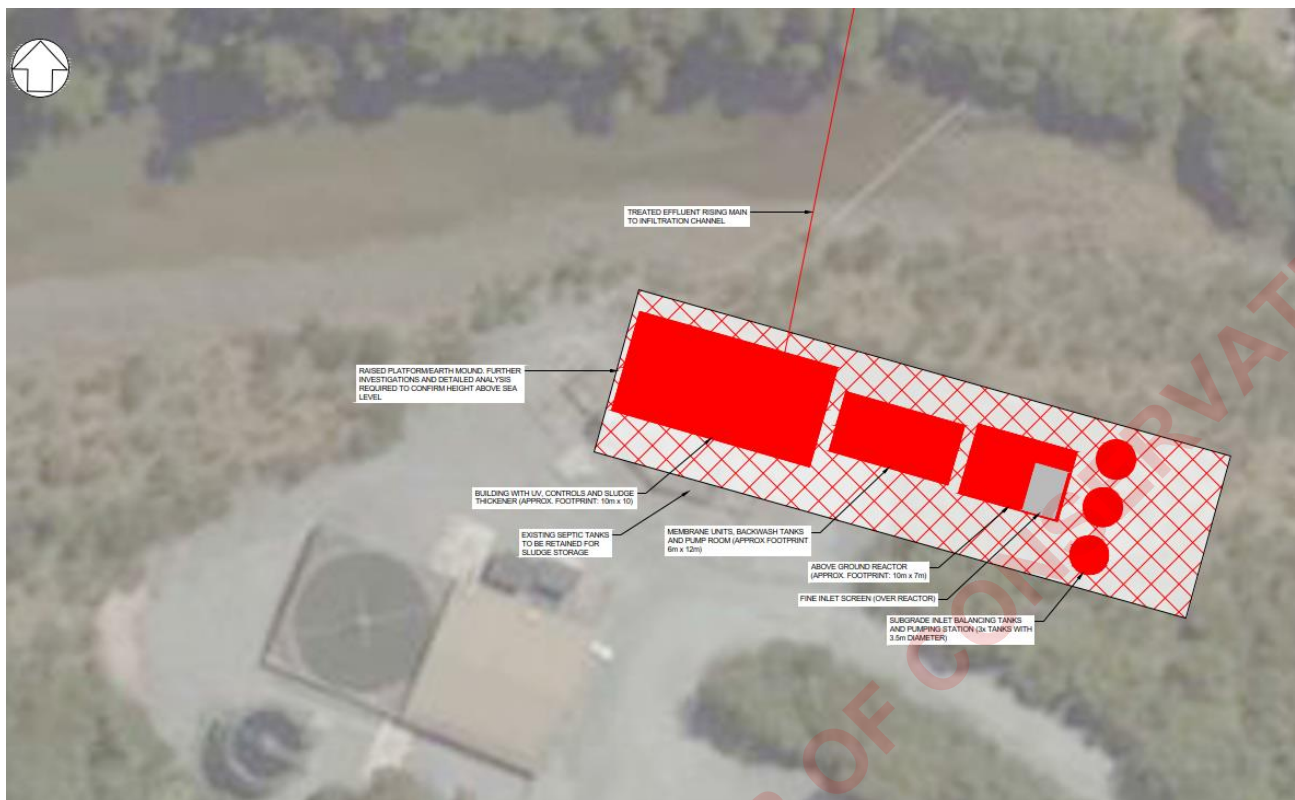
Milford Sound Piopiotahi Indicative Wastewater Treatment Plant Layout
